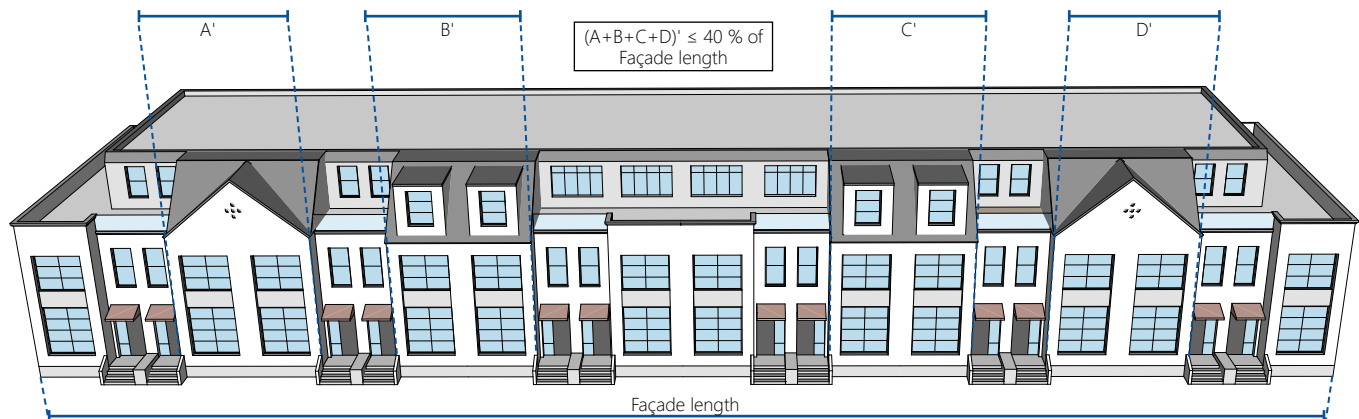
Visible sloped roofs are allowed to encroach into the required Upper Floor Stepback, up to a maximum width of 40% of the façade length.
